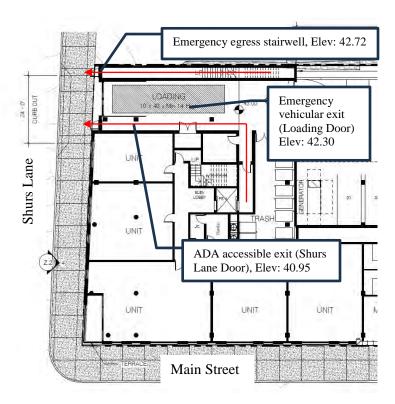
Second floor building access points (per CBP Architect 3/11/24 plans)
